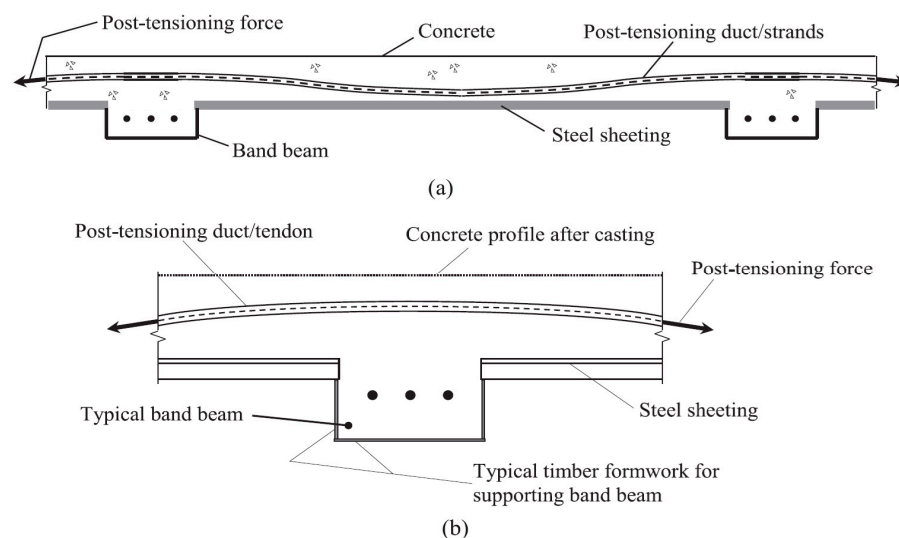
(a) Typical elevation of a post-tensioned composite slab supported by band beams; (b) Typical construction detail of profiled steel sheeting being supported via the band beam before concrete pour [237].
